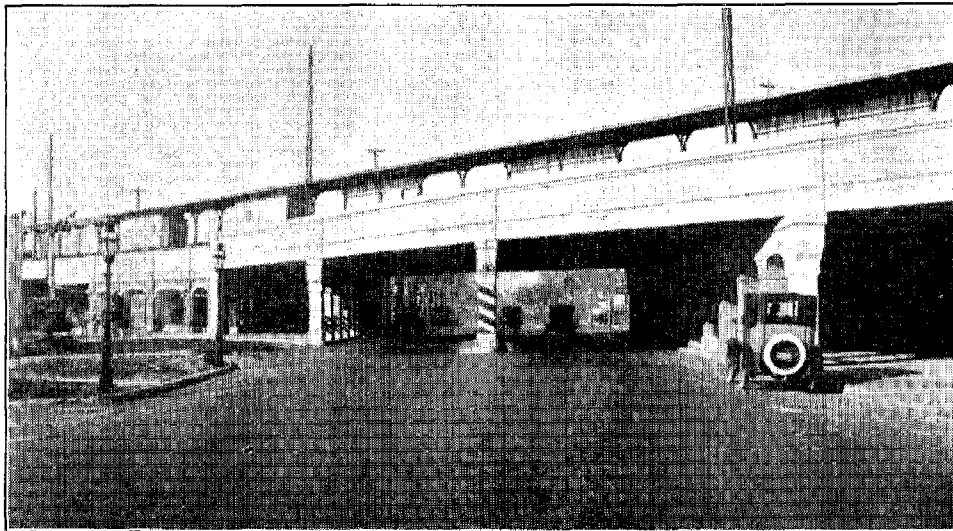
Station on the Northwestern Elevated Railway in Chicago.
